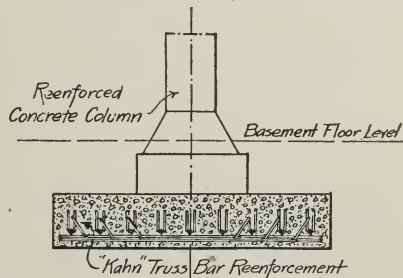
Reinforced Concrete Footing for Heavily Loaded Column.
